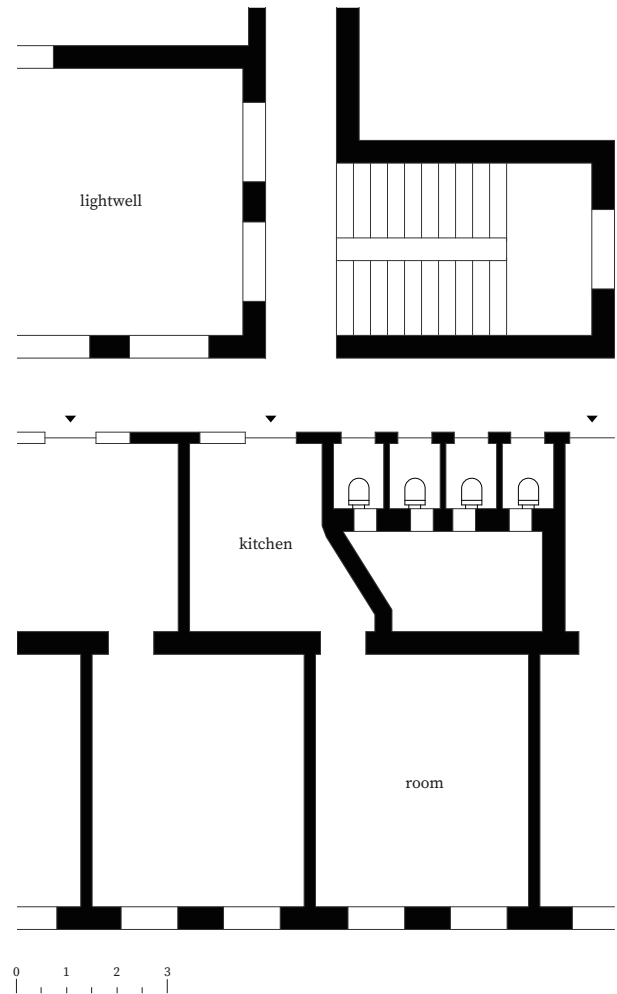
Plan of a unit in corridor-kitchen apartment - 1:150
